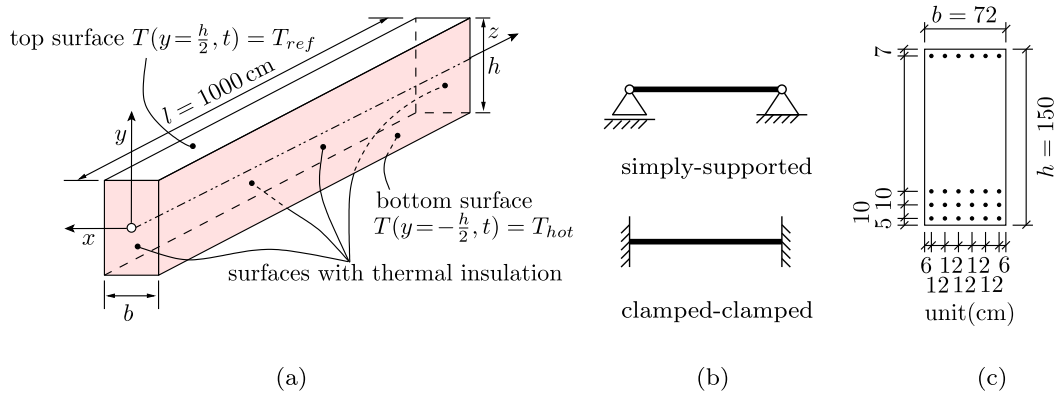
Reinforced concrete beams (a) subjected to sudden heating at their bottom surfaces, (b) with two types of mechanical boundary conditions, and (c) the dimensions of the cross-section and the properties of the steel reinforcements are inspired by the overhead-slab of the segments of the immersed tunnel of the Hong Kong-Zhuhai-Macao Bridge, see Fig. 2.
